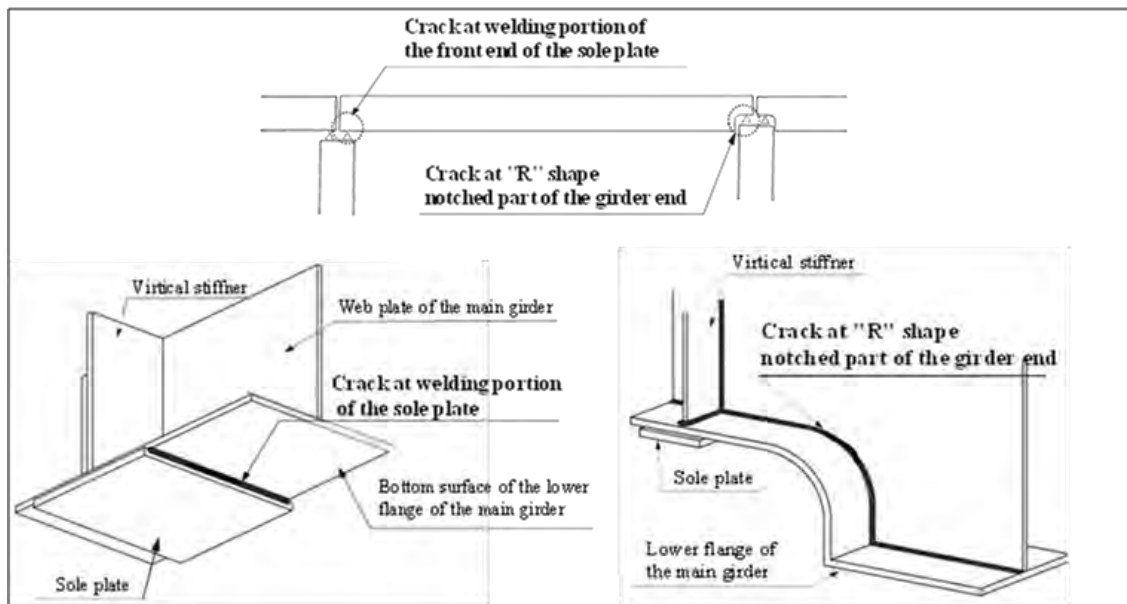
Crack at Welding Portion of the Front End of the Sole Plate
